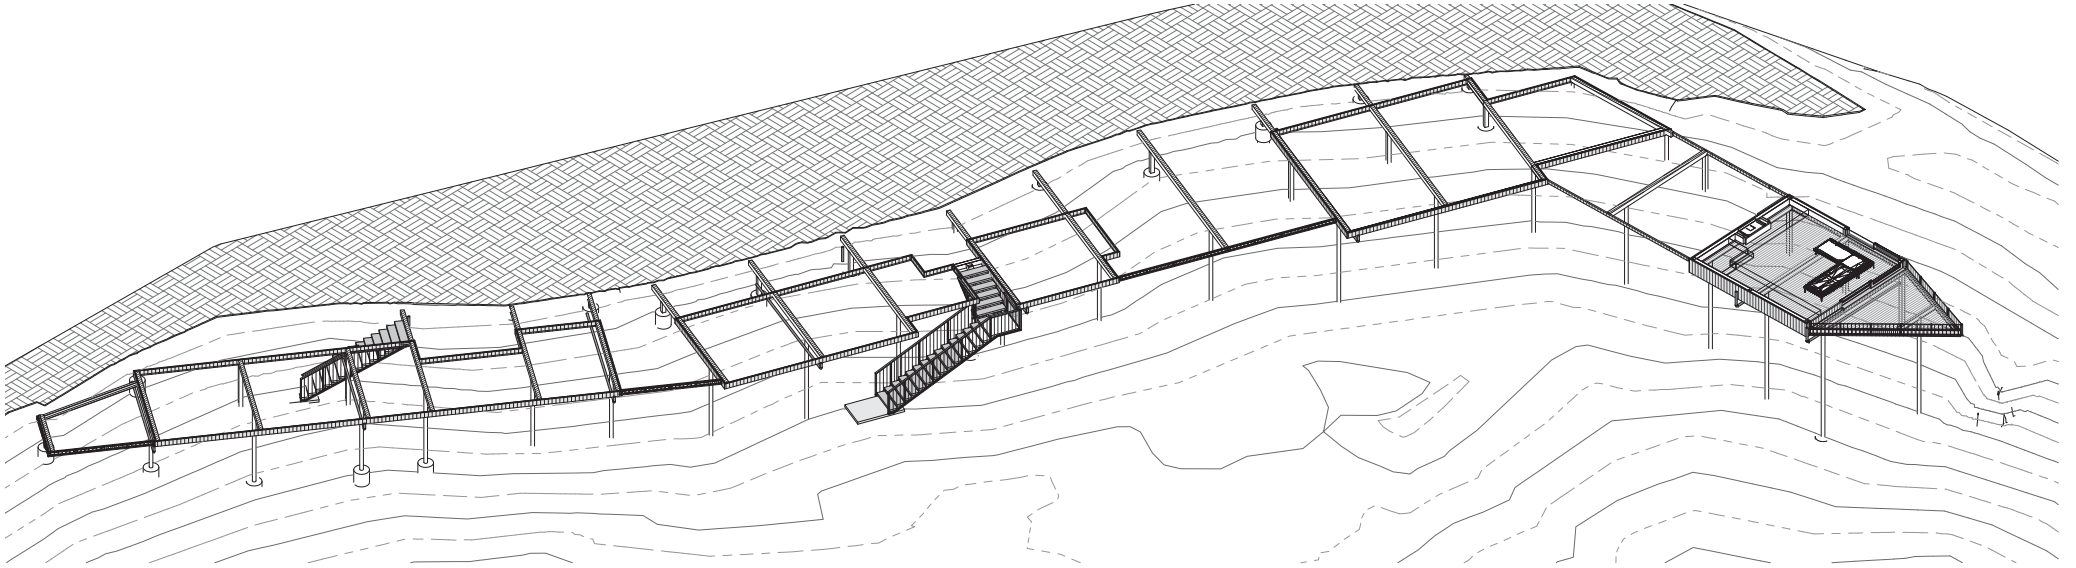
Site plan showing the contours of the site and the set out of the 48 pile locations. Steel pile caps are cast into the concrete piles, then steel portal frames are welded to the pile caps.
